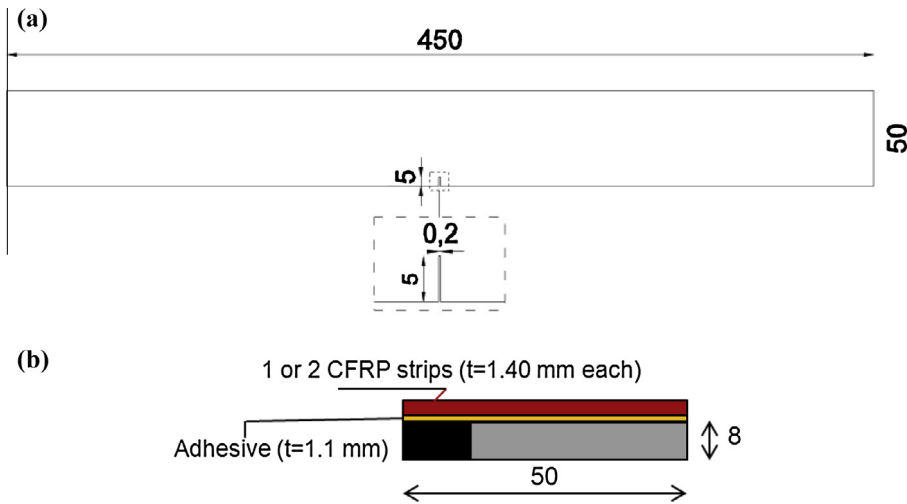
SENT specimen geometry: (a) steel plate and (b) specimen reinforcement.
